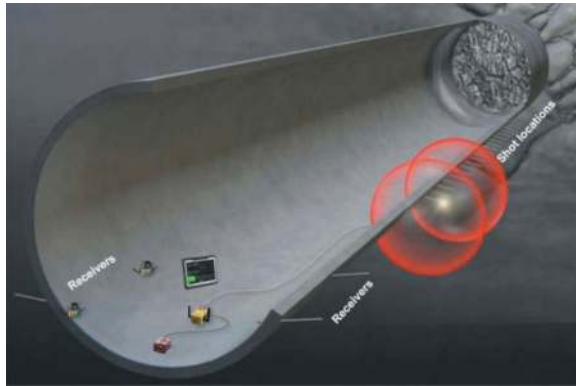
Schematic visualisation of a standard TSP layout in conventional tunnelling.
